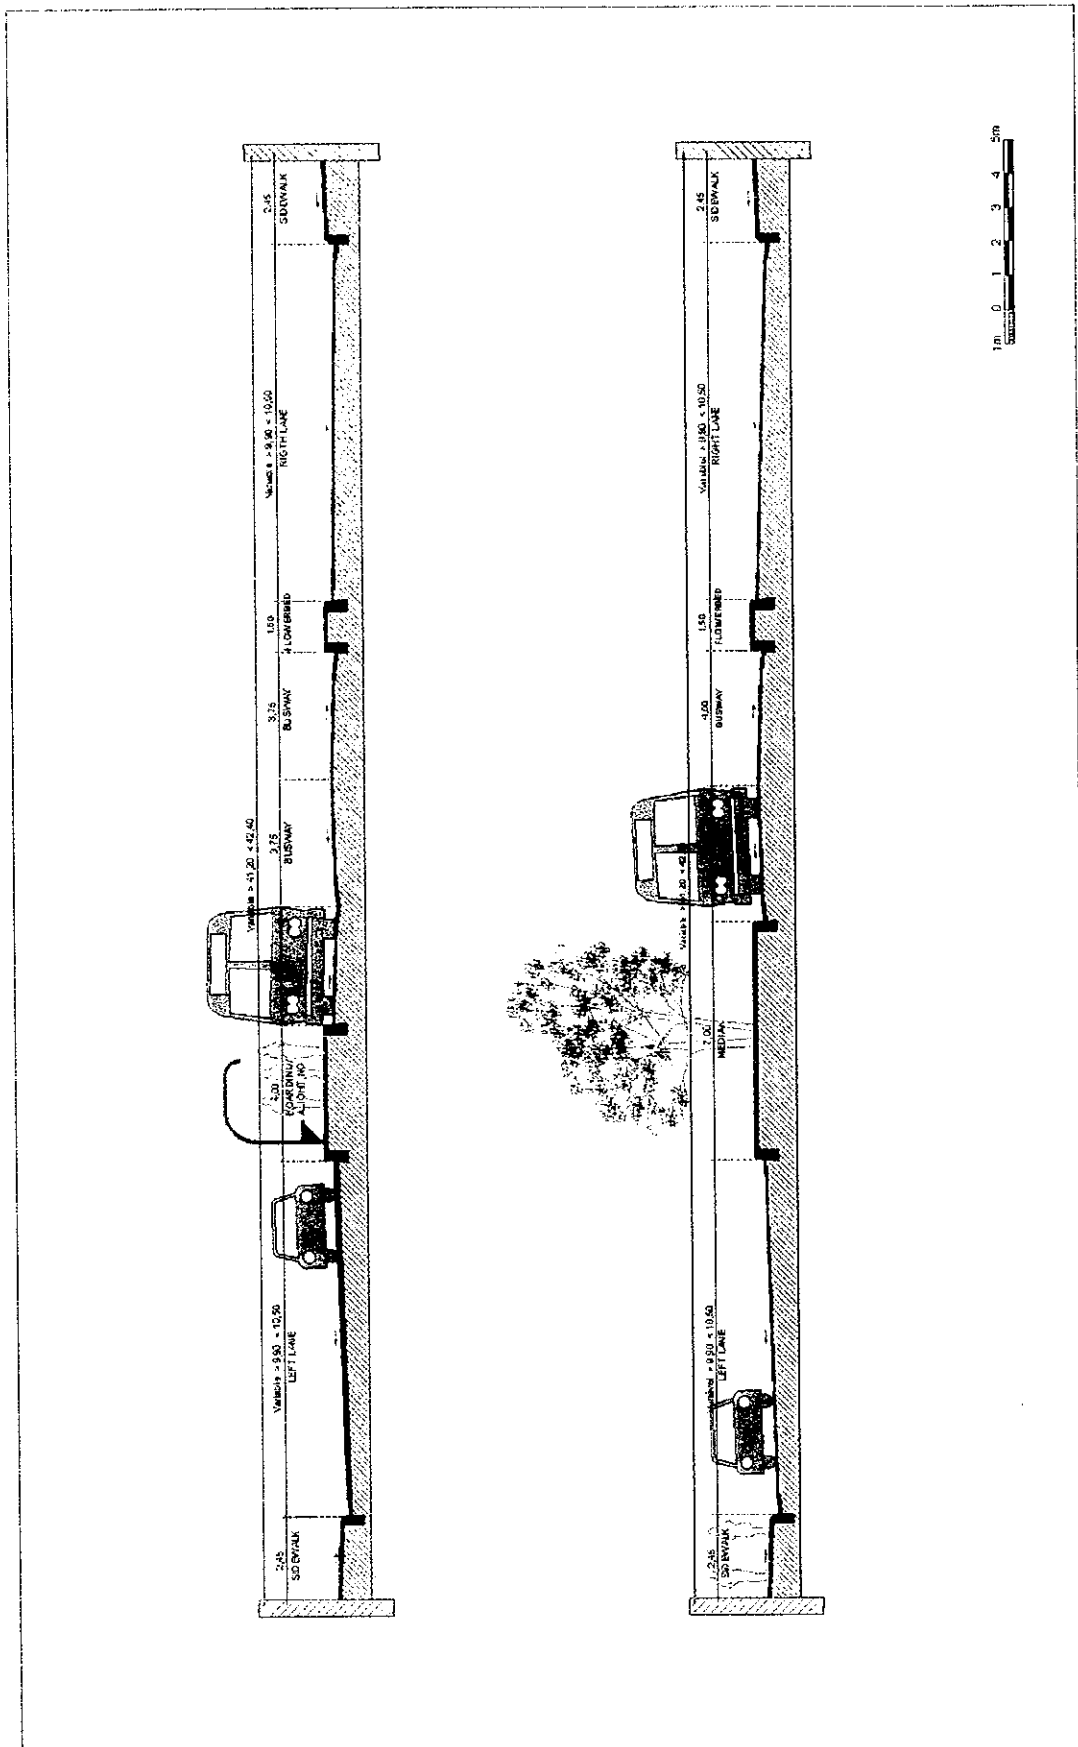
Almirante Barroso Ave. - Transversal Sections Type
